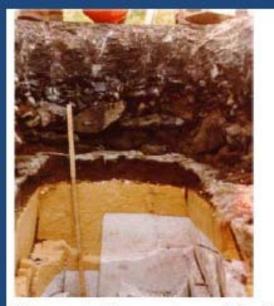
Excavation of the first EPS embankment at Flom bridge (EPS and polyurethane as protective layer).
